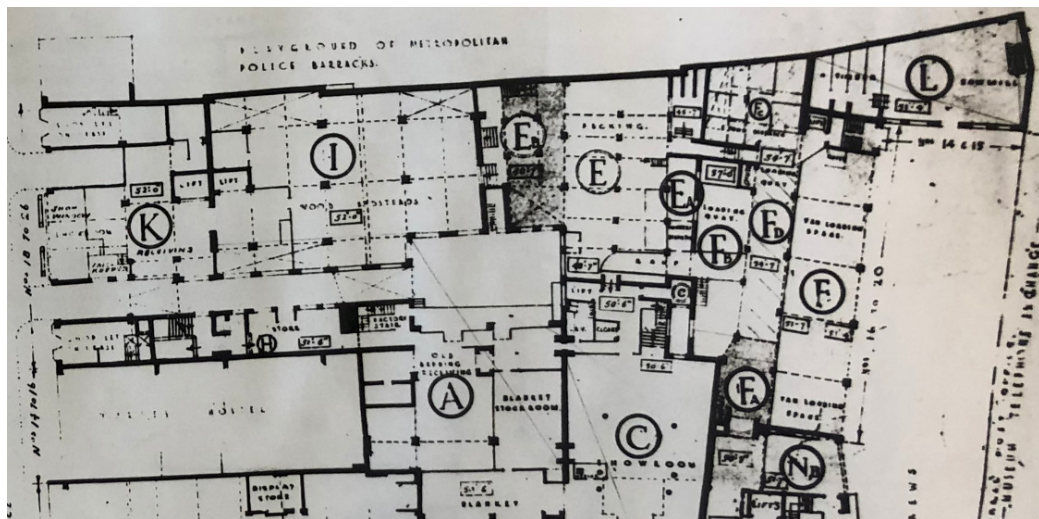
Extract of 1937 Ground Floor Plan (focus on rear area and depth of the site)
